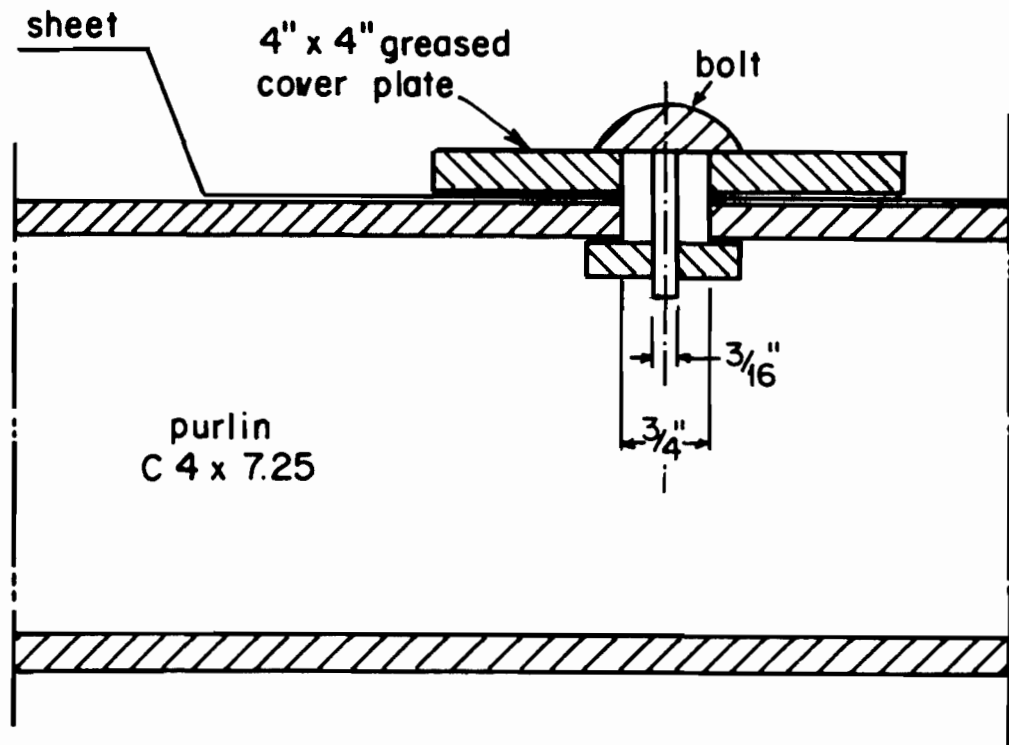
Cross-section detail of "non-load resisting connection" between sheet and intermediate purlin
